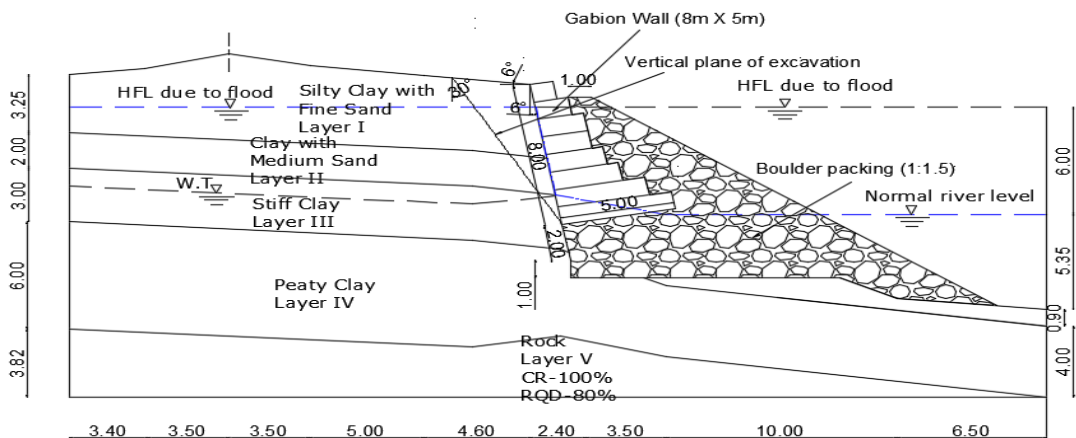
Proposed Gabion wall section (8 m X 5 m) at location 1
